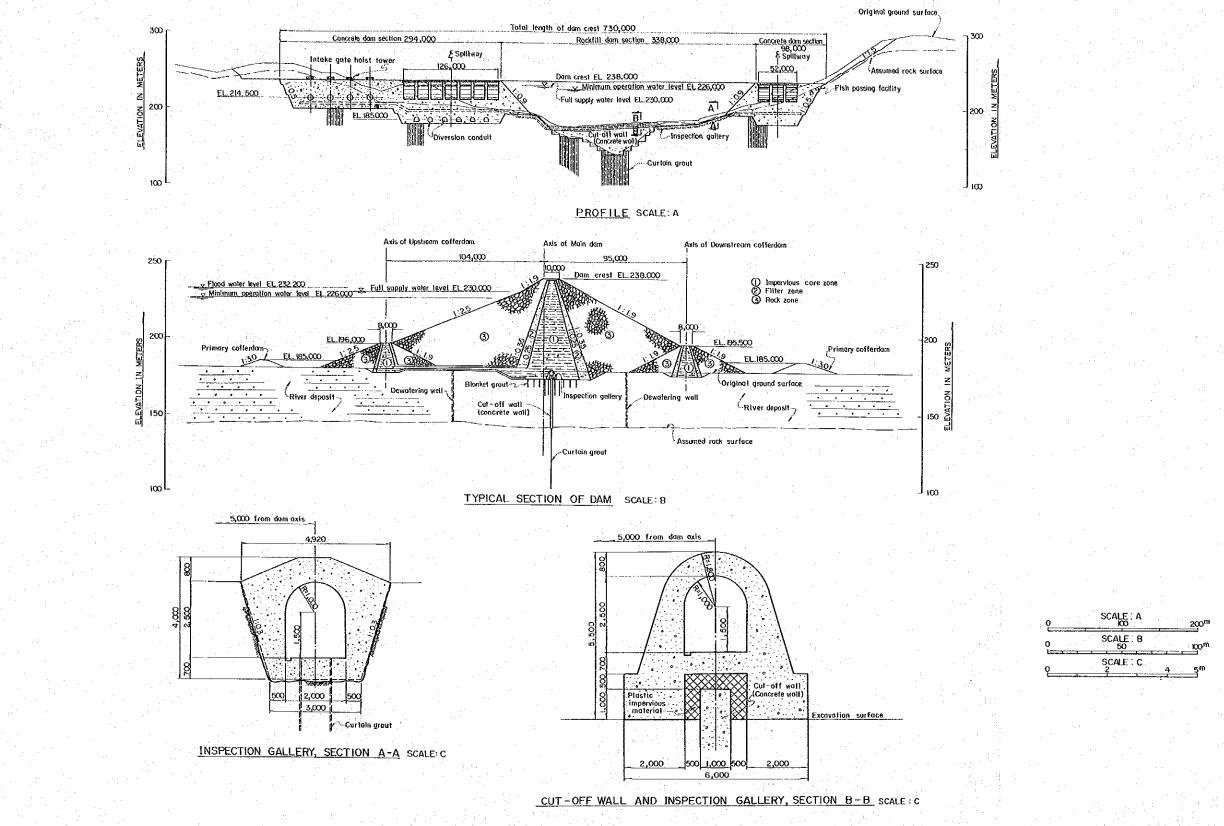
PROFILE AND SECTIONS OF DAM(SCHEME : FILL DAM, DAMSITE-B, F.S.L 230, 225MW INSTALLED CAPACITY)
